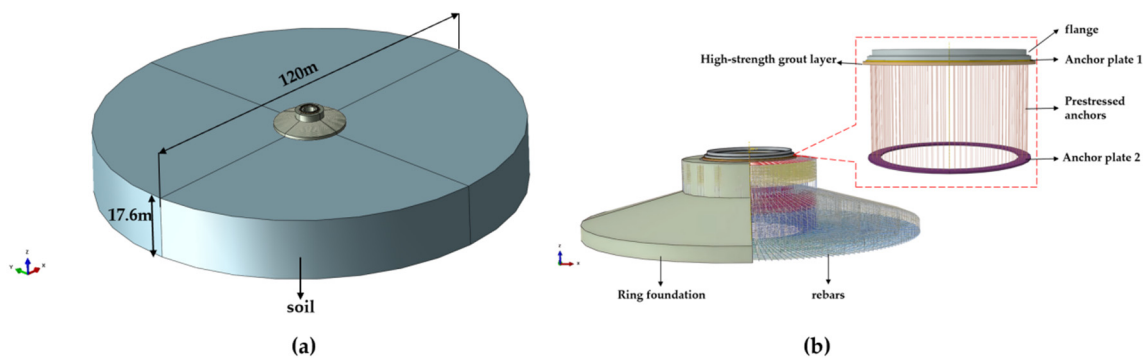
Finite element model: (a) foundation and soil and (b) details of the foundation.
